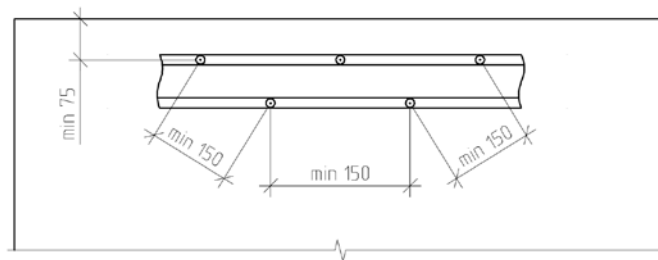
Recommended scheme of the attachment of the curtain wall subframe
